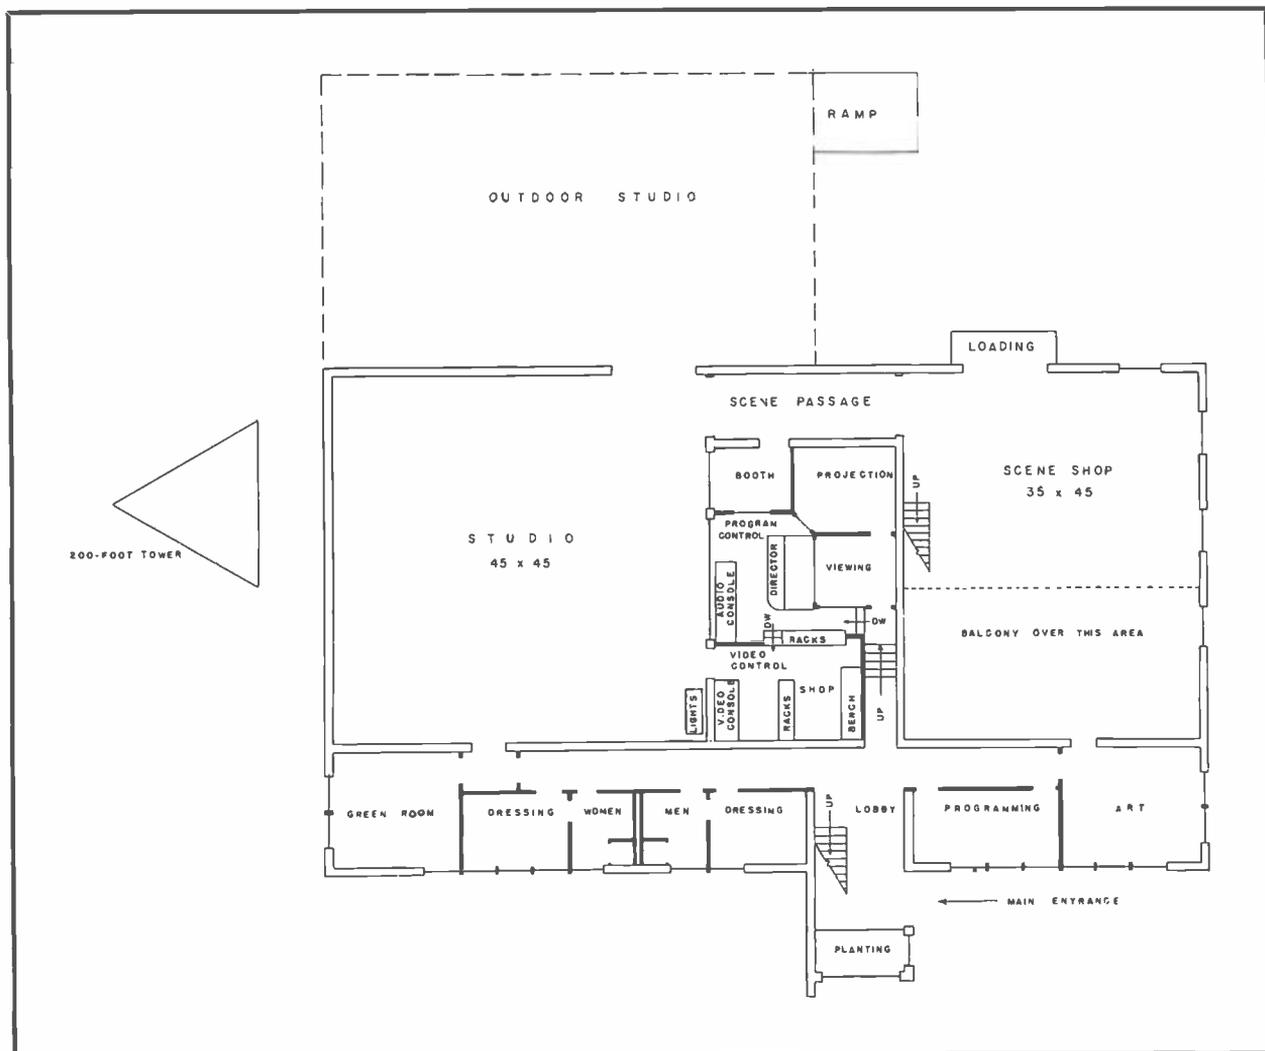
Ground floor of State College Studio in Raleigh. (Offices are located on the second floor, in the front section of the building.)
